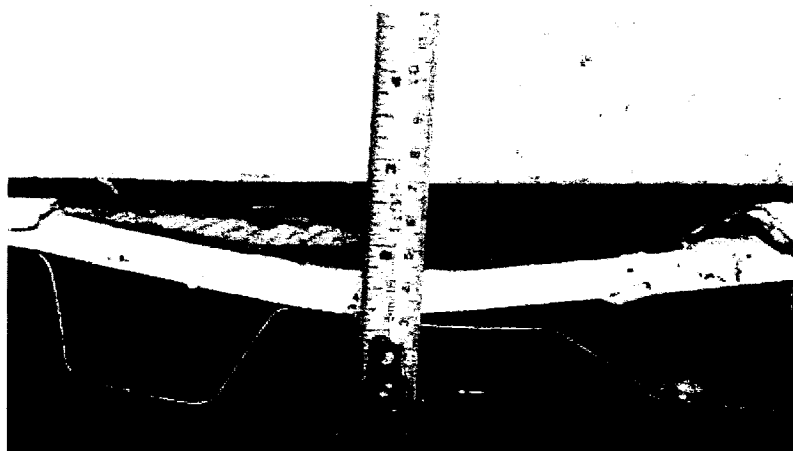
Steel deck flute height diminished, gypsum board cracked (Yang, 2003)
